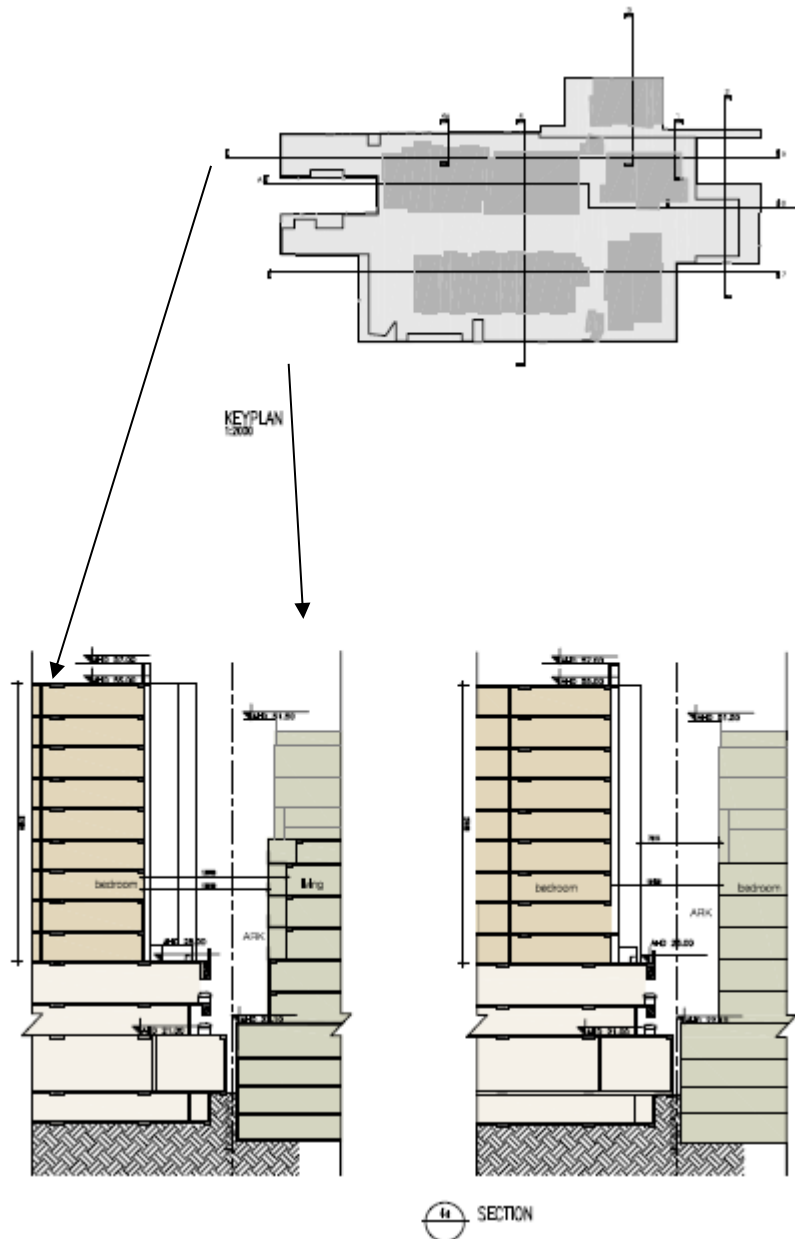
Section through building A (proposed) and ARK (TP-30, Revision 1)
